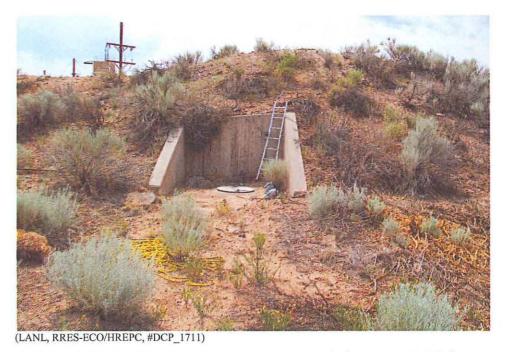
Cable Tunnel Entrance with Manhole, Near TA-33-87
